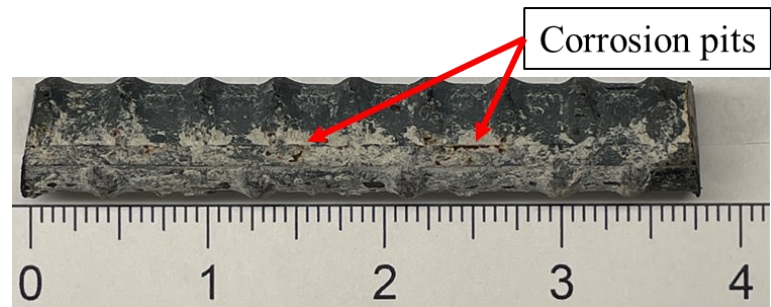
Extracted Black Rebar from Concrete Core Specimens.
